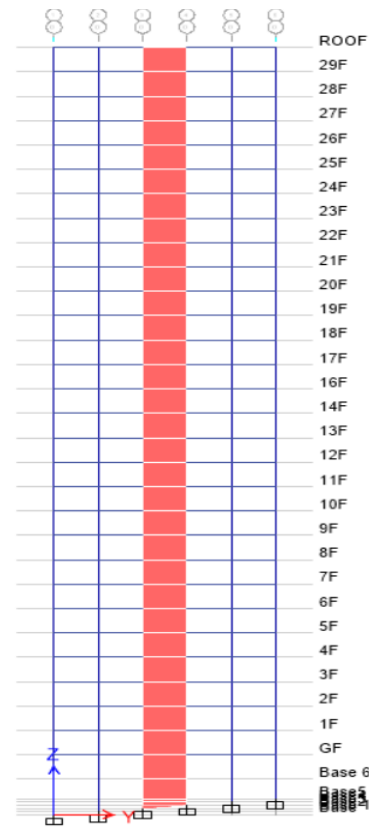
Elevation view of without outrigger bracing system for 5 degree sloping ground.
